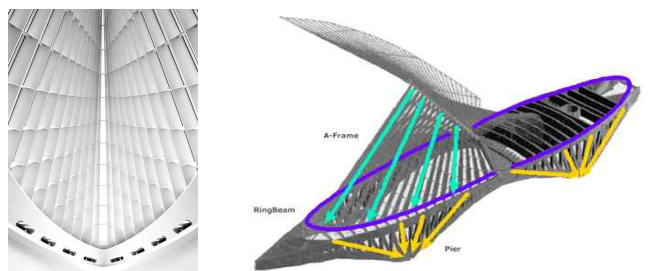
A-Shaped Frame(left) and Concept Diagram of Roof Structure(right)
